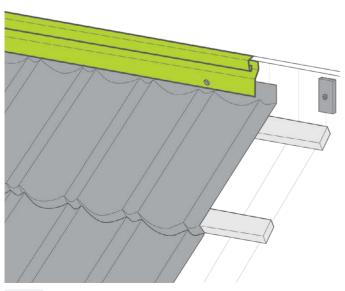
FIXING HORIZONTAL FLASHINGS (ALTERNATIVE)
